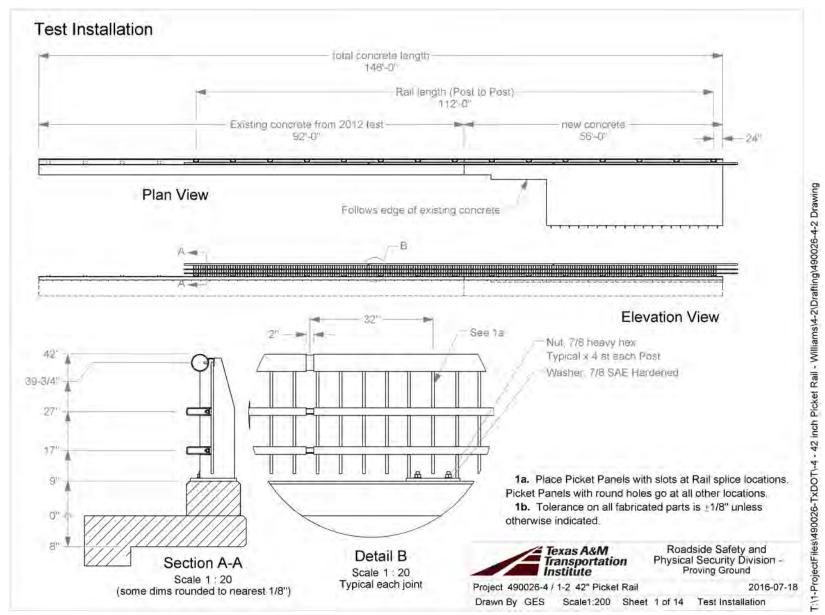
General Layout of the TxDOT Type C2P Bridge Rail for Test No. 490026-4-1 and 4-2.
